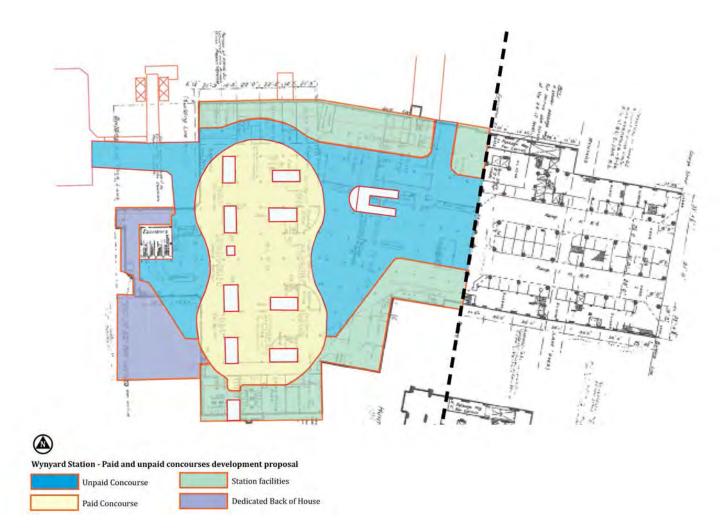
The proposed works overlayed over the original layout of Wynyard Station (Source: Futurepast 20/10/2014)
